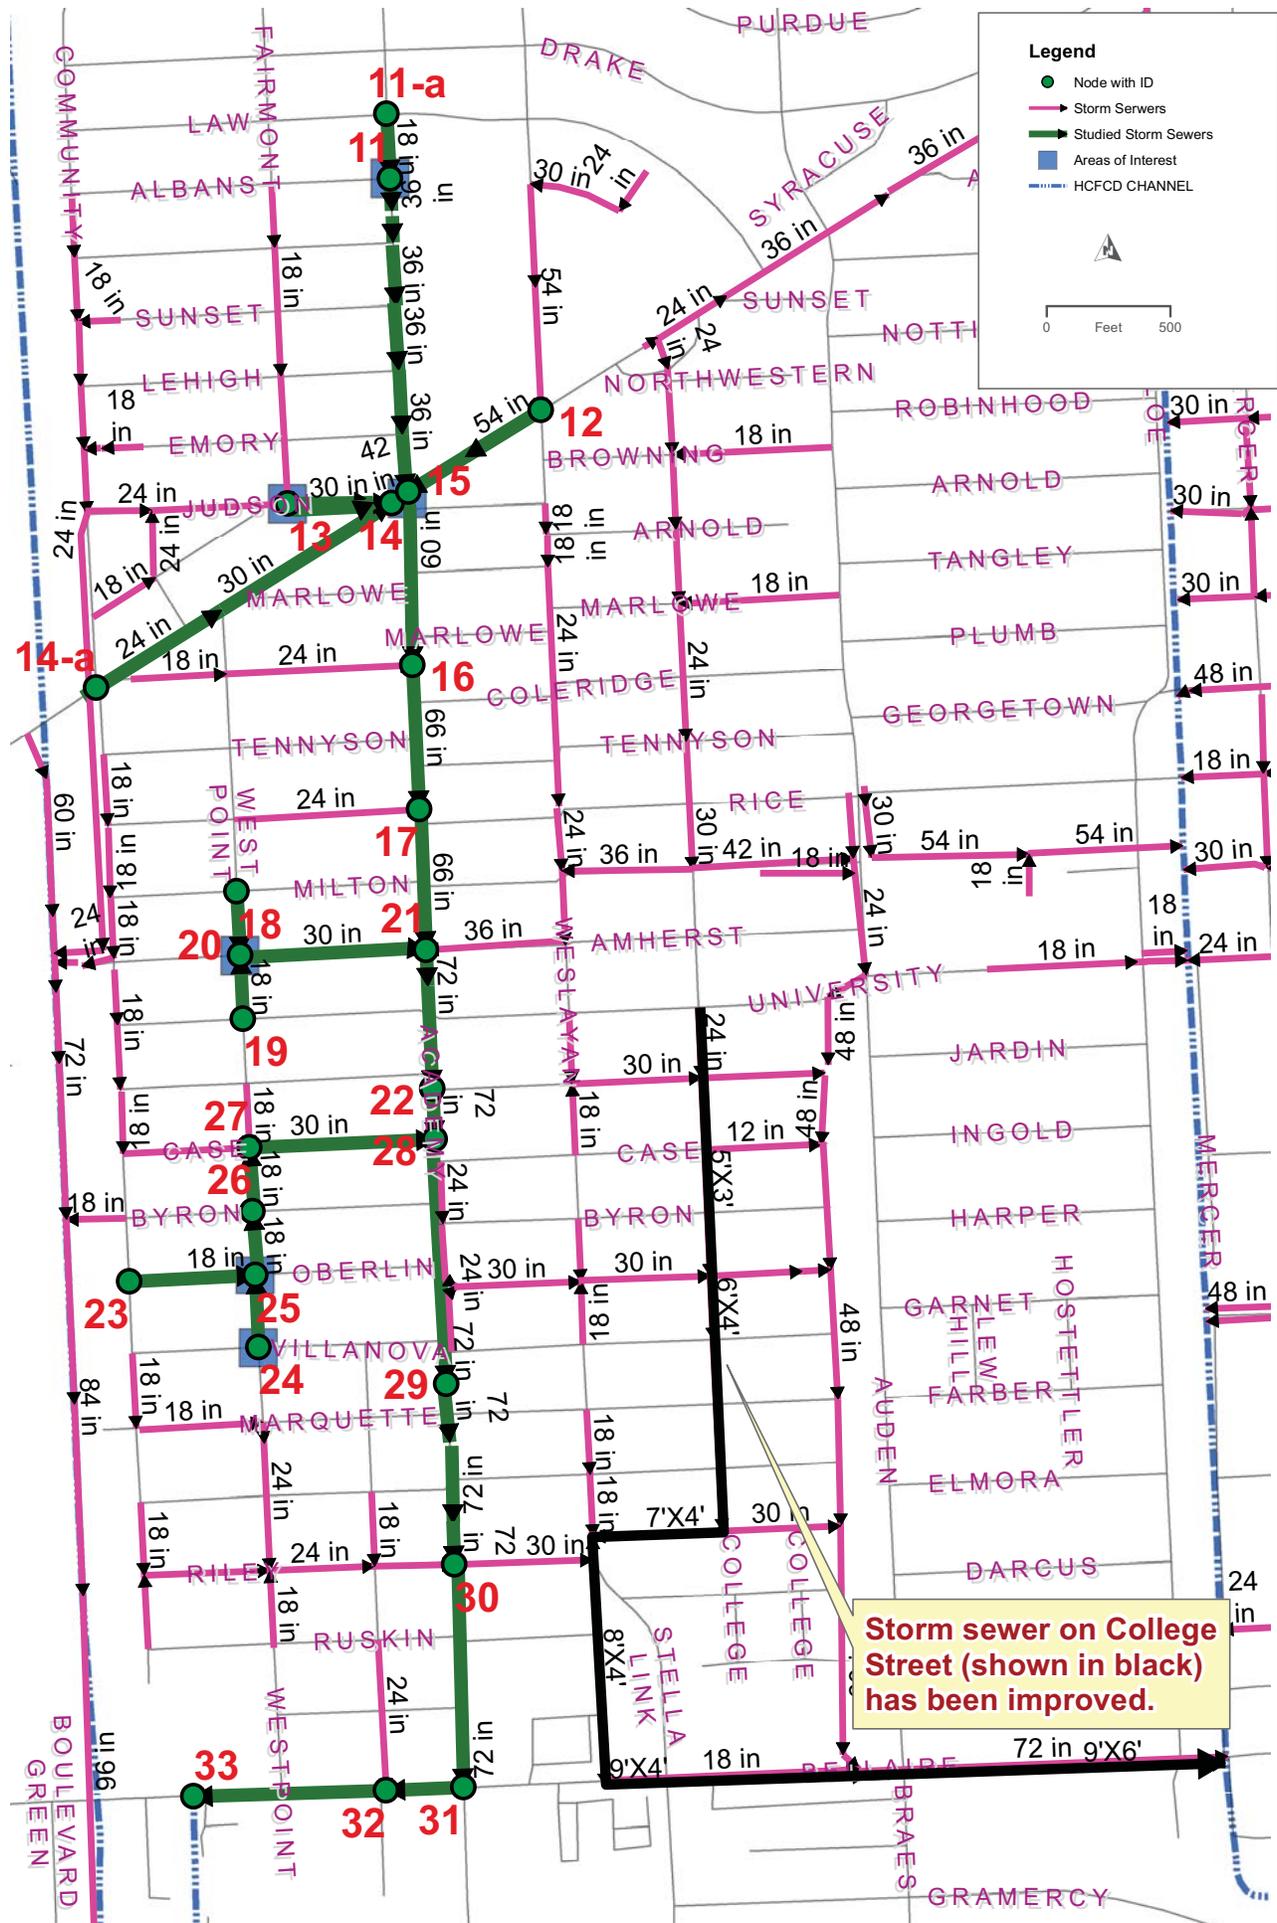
STORM SEWER LAYOUT IN PROJECT AREA
